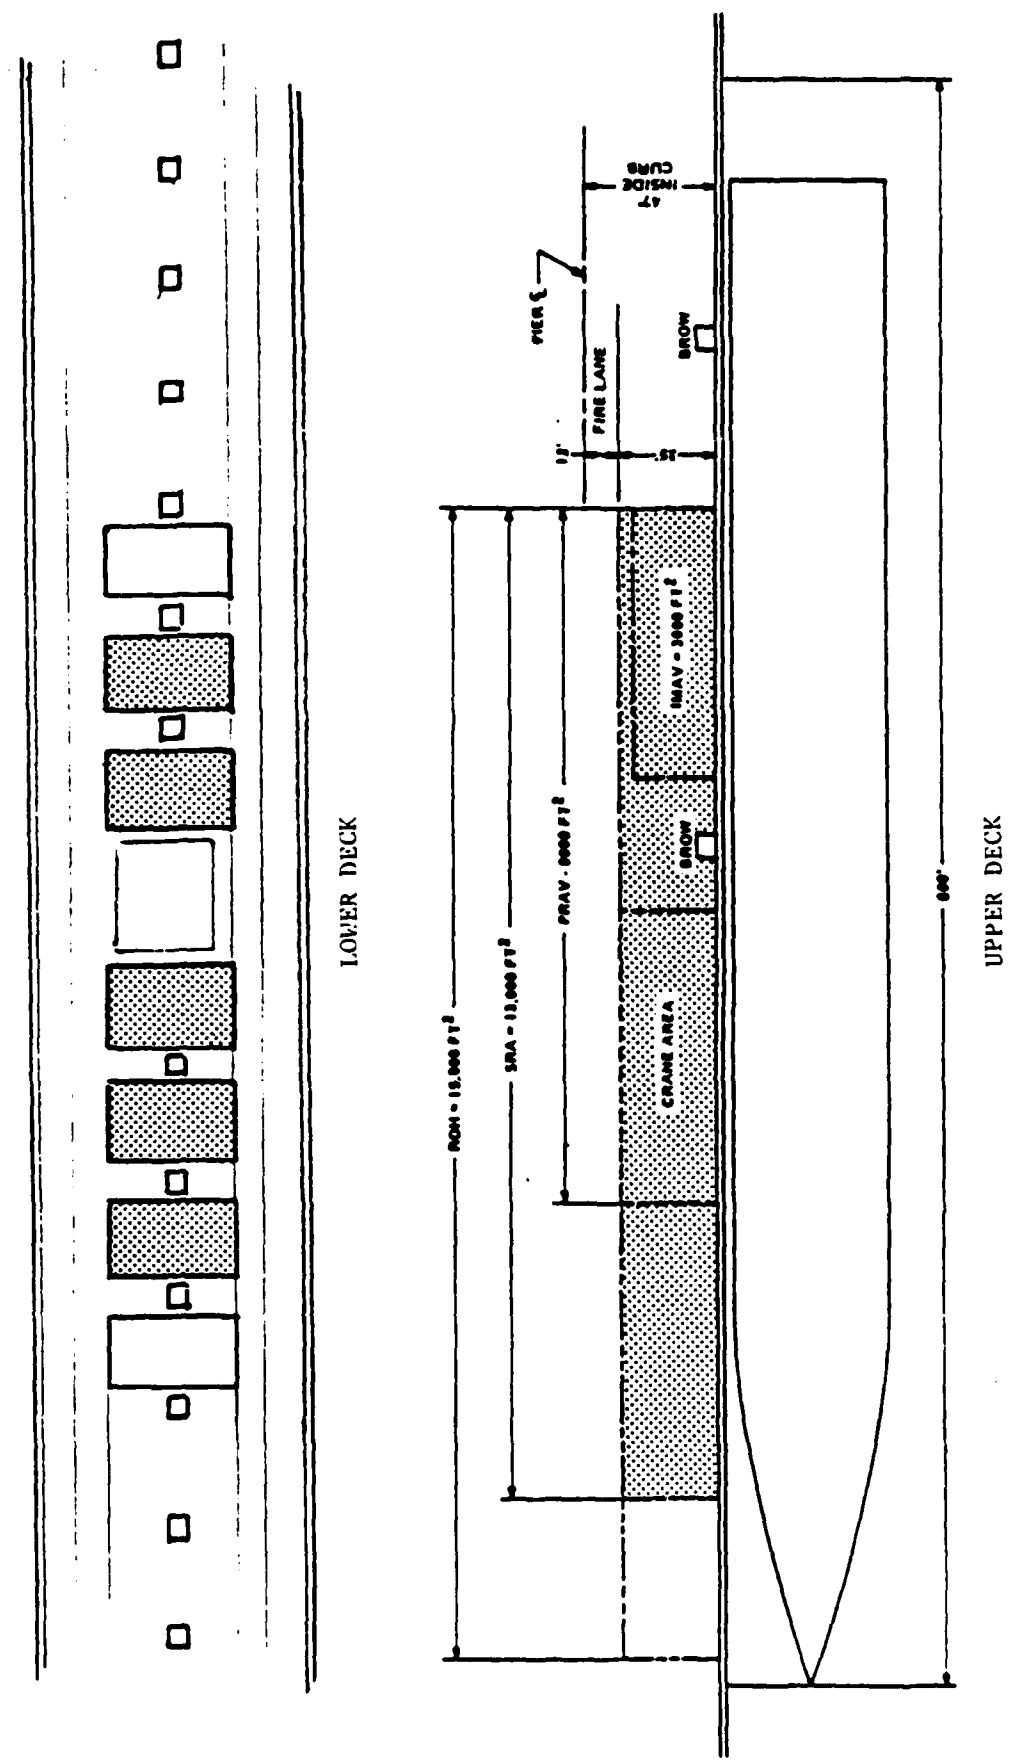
Space Requirements for SRA - Double-Deck Pier.
